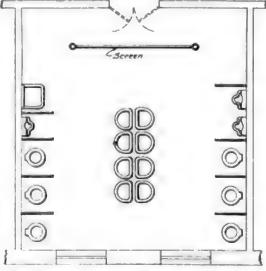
Typical Arrangement of Toilet Rooms in Buildings of the First Class
